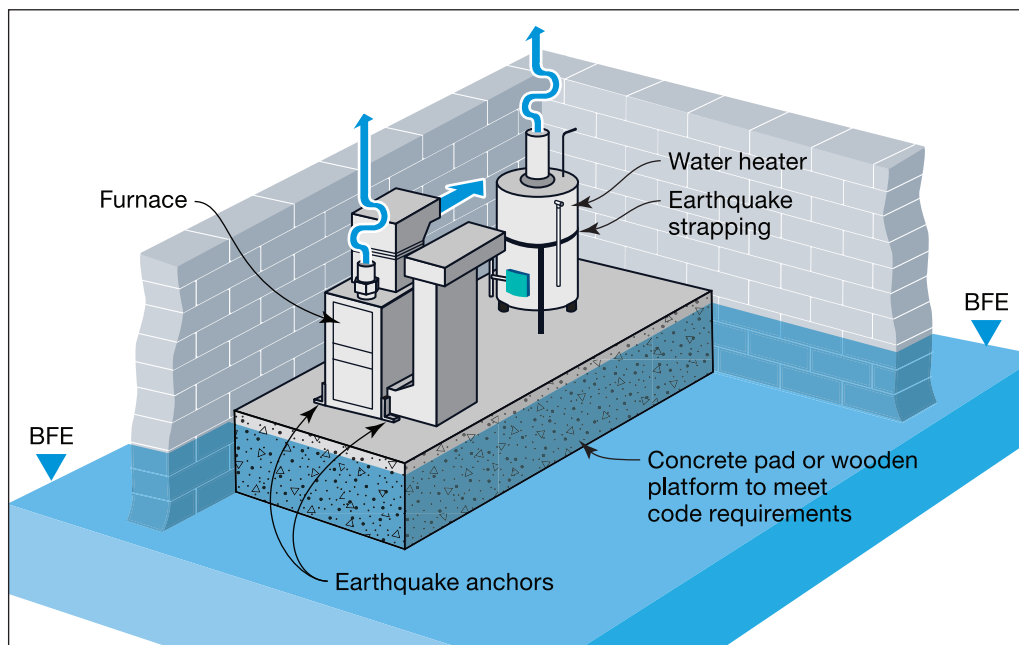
Elevation of mechanical equipment on an elevated platform in an area with the original slab below the BFE
